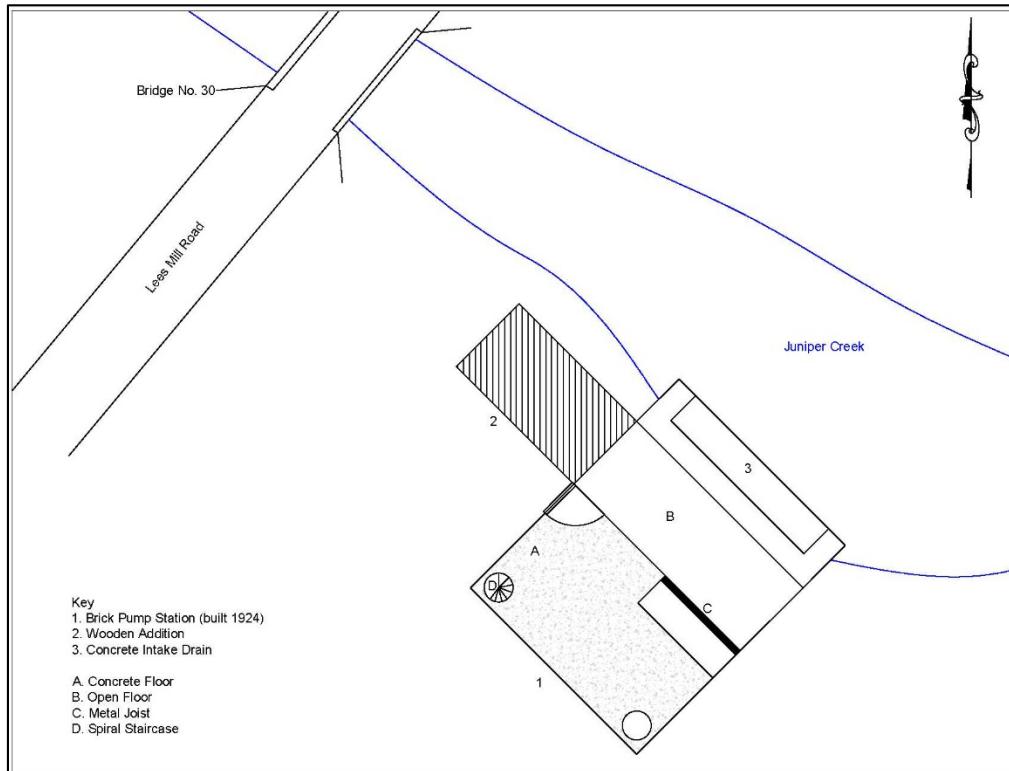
Site plan of the Laurinburg Pump Station, not to scale.
